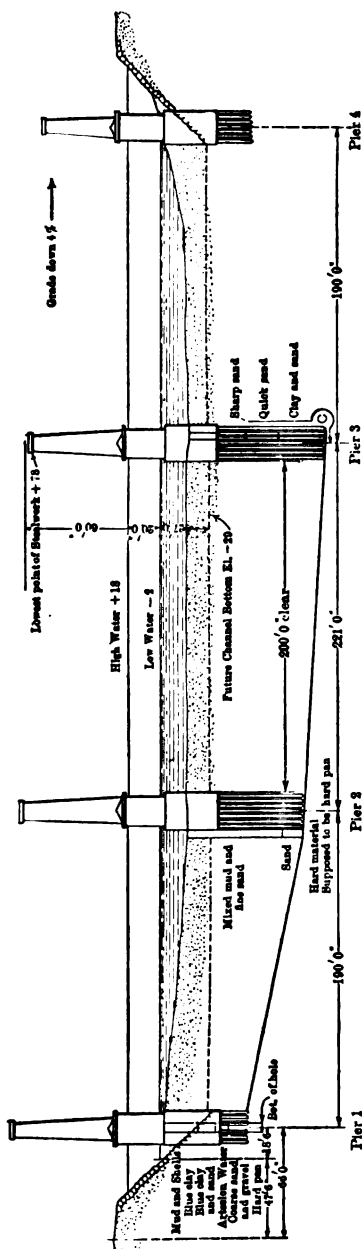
TACOMA, WN., PROFILE OF PIERS AND SOUNDINGS.
